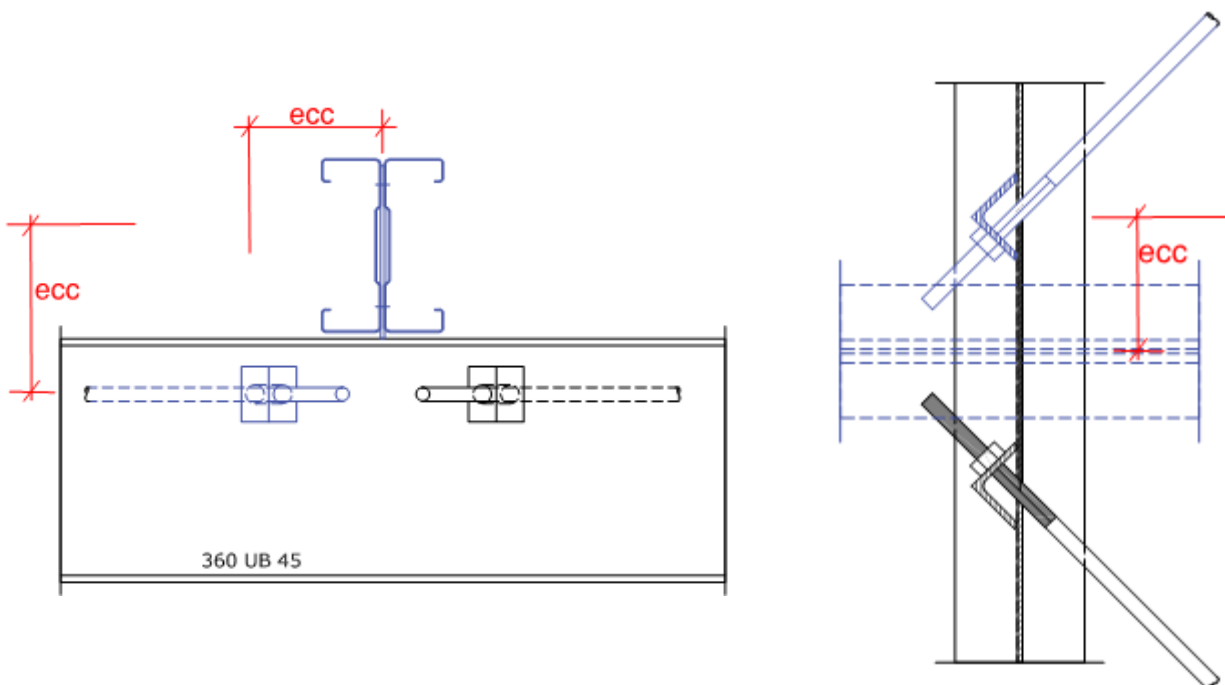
Completed elevated and plan view of connection of purlin struts to tension-only bracing noting eccentricities
